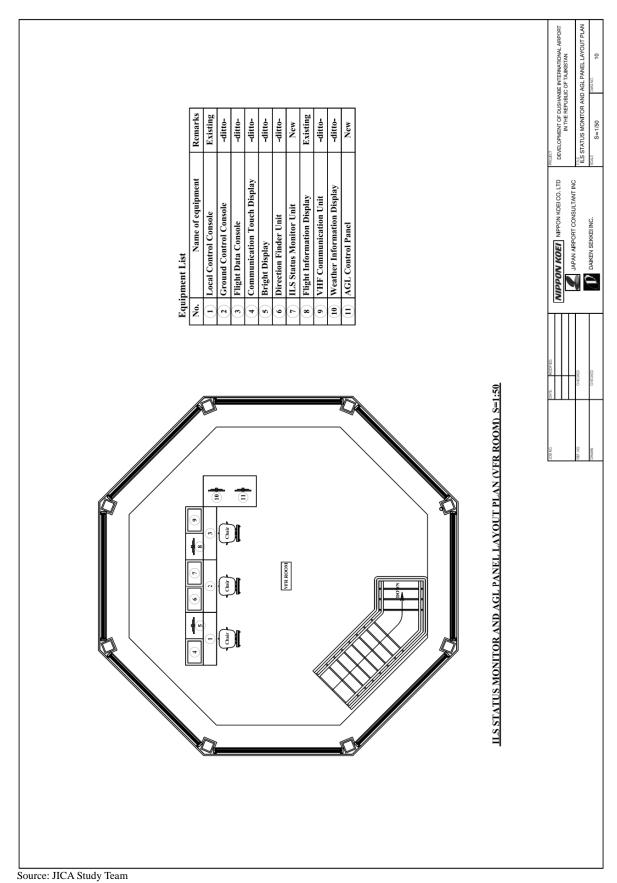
ILS Status Monitor and AGL Panel Layout Plan
